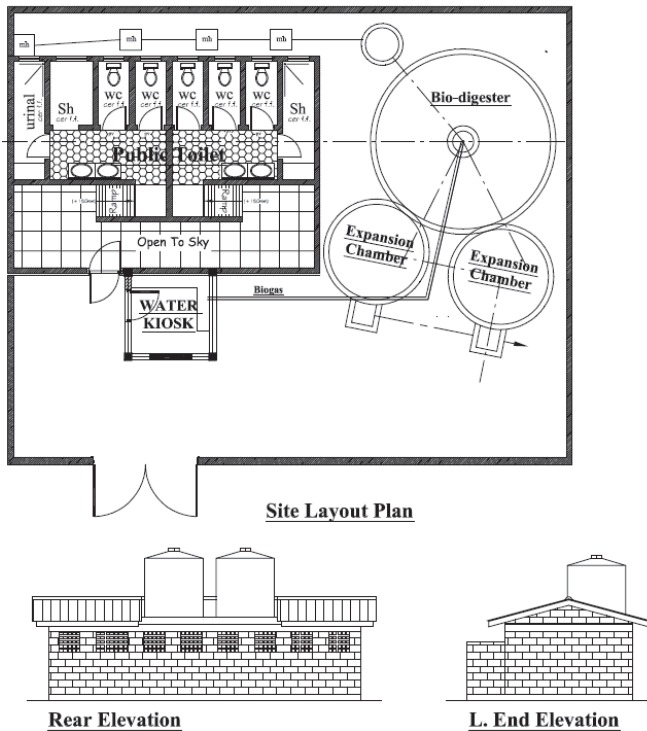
Technical drawing of the facility and biogas plant (source: EPP). Space requirement for toilet and biogas plant is approx. 10 x 15 m.
